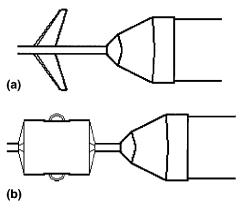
Innovative Bursting Head Configurations: (a) Cutting Fins; (b) Cutting Wheels
